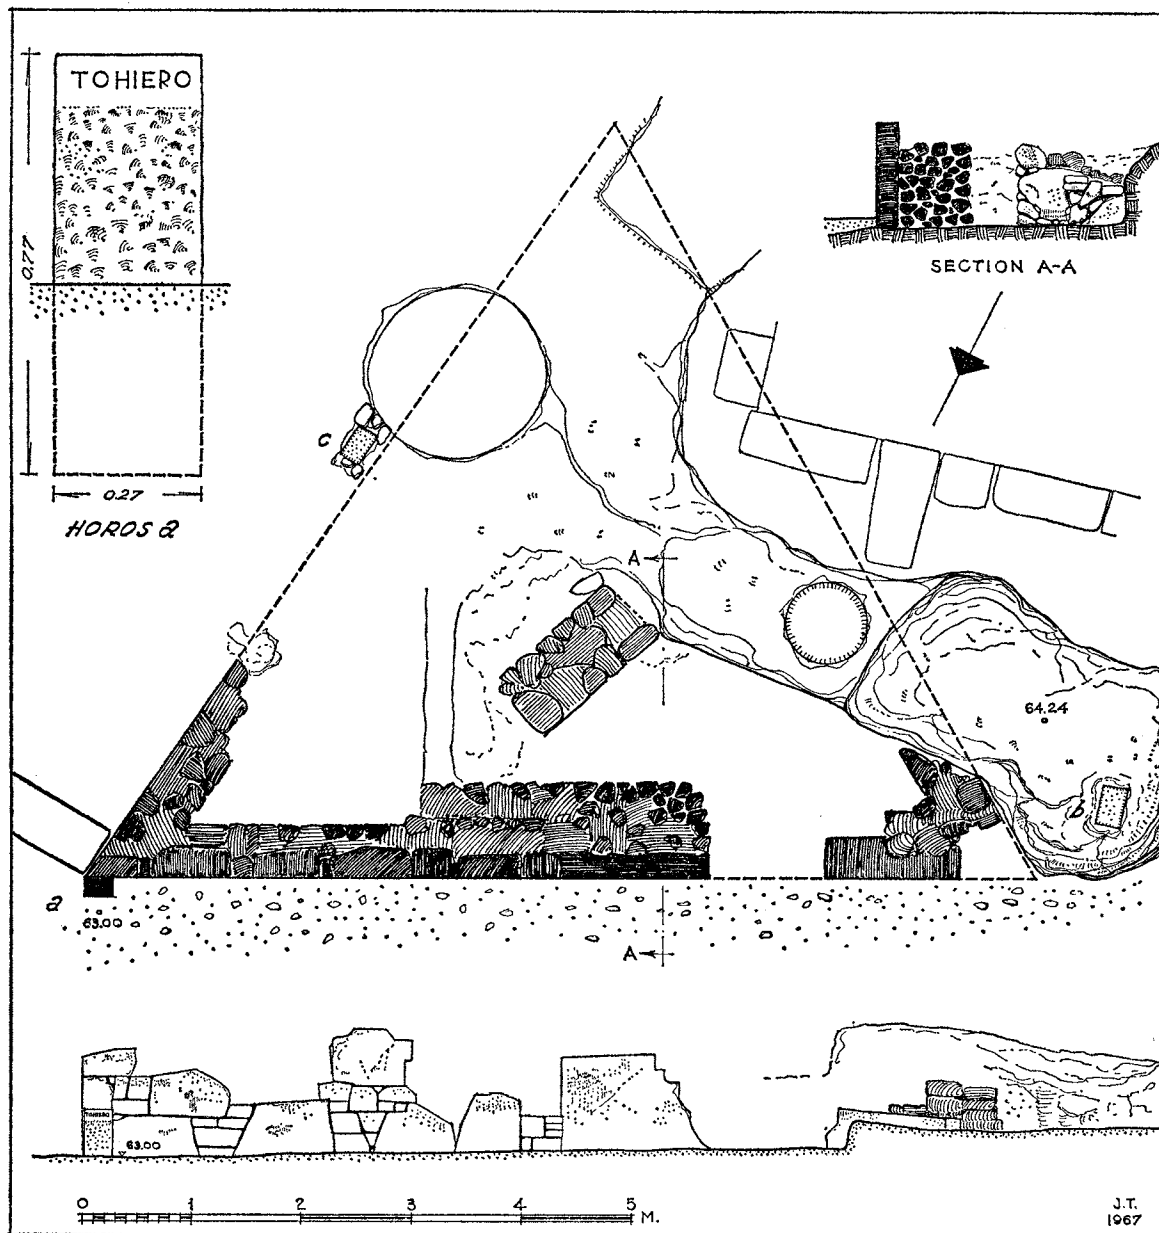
Actual State Plan, Elevation and Section of Hieron.
